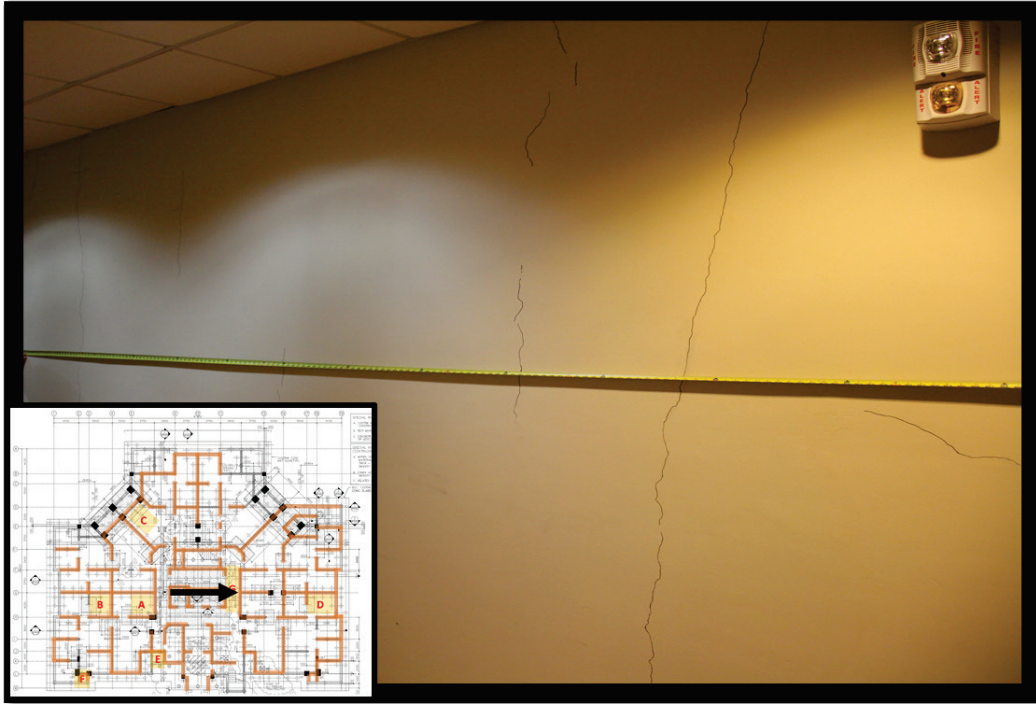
Wall cracks within the Tower 1 basement storage area (Section G of the floorplan insert). The widest observed crack width was less than 0.40 mm. The shown cracks were traced with a permanent marker to highlight typical locations, lengths, and spacing and are not representative of crack width.
